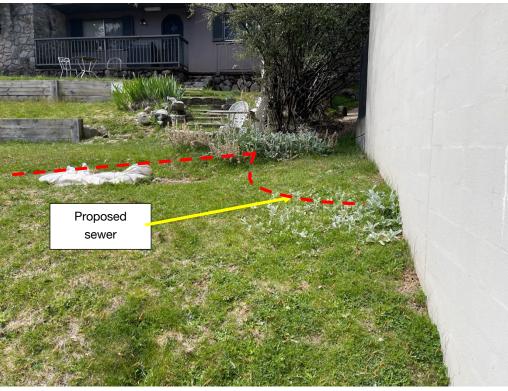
View of rear of Sashas Apartments showing proposed sewer connection.
